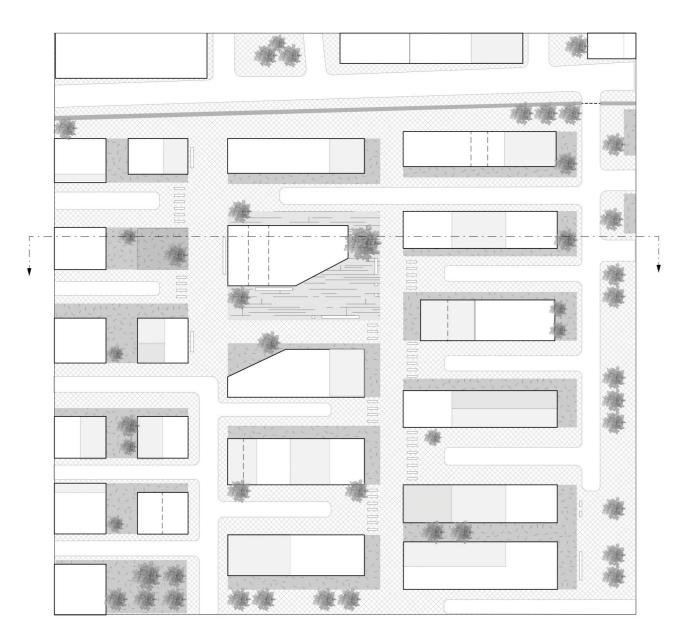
Nijiaqiao neighbourhood design plan. Source: Author
